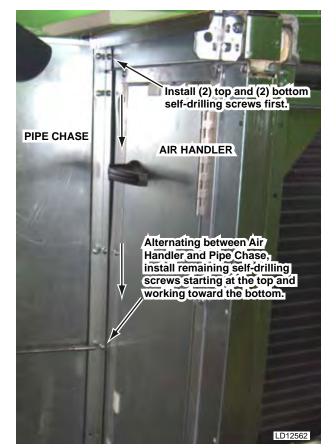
PROPER PATTERN FOR INSTALLING SELF-DRILLING SCREWS TO COVER ANGLE
